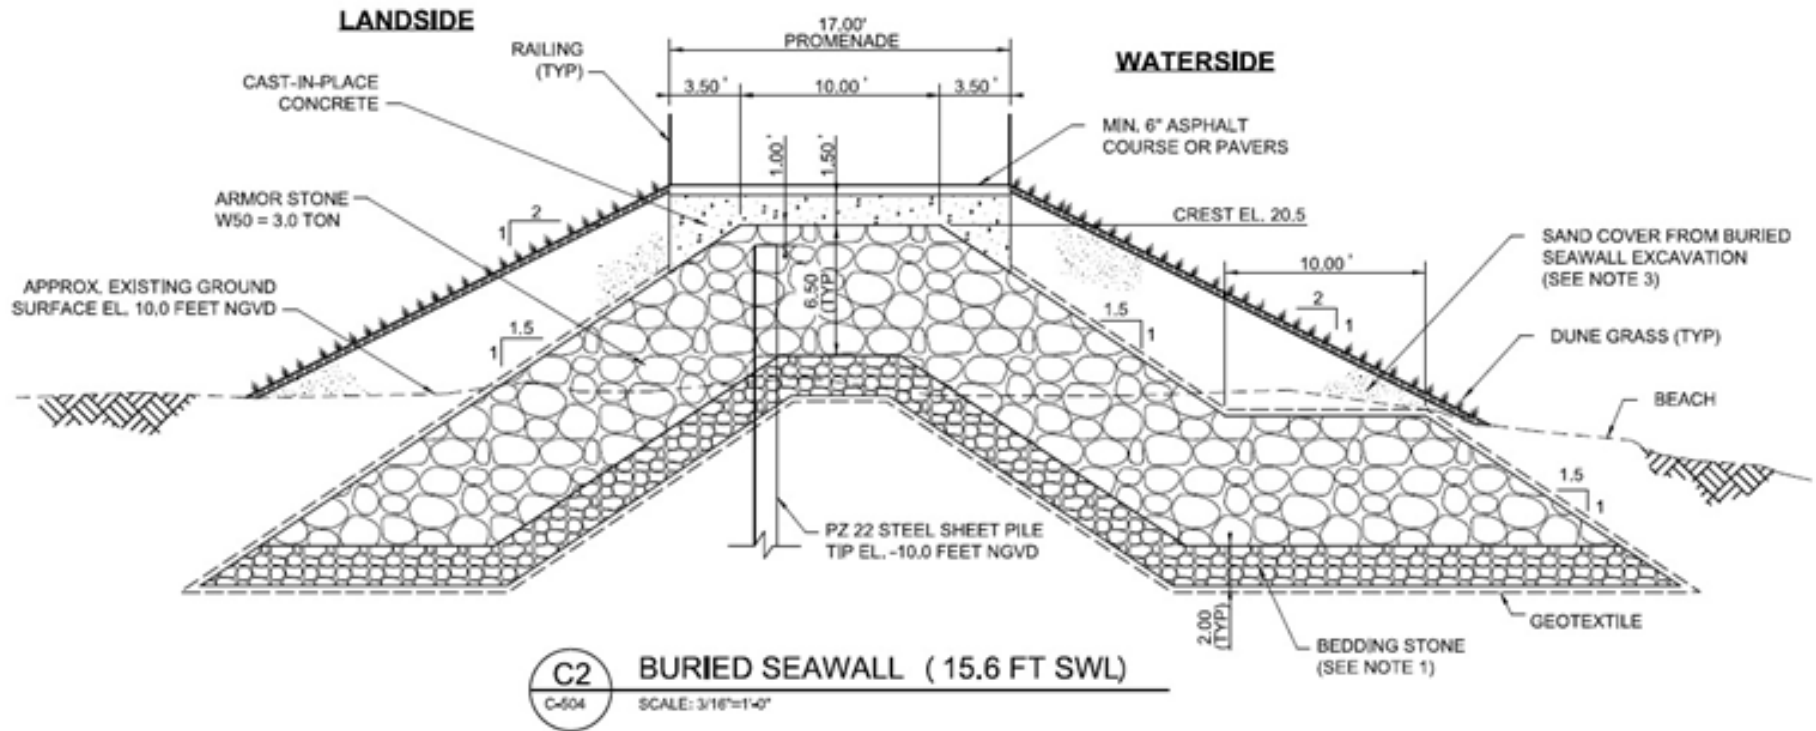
Buried Seawall Typical Section (Reach A-4)
